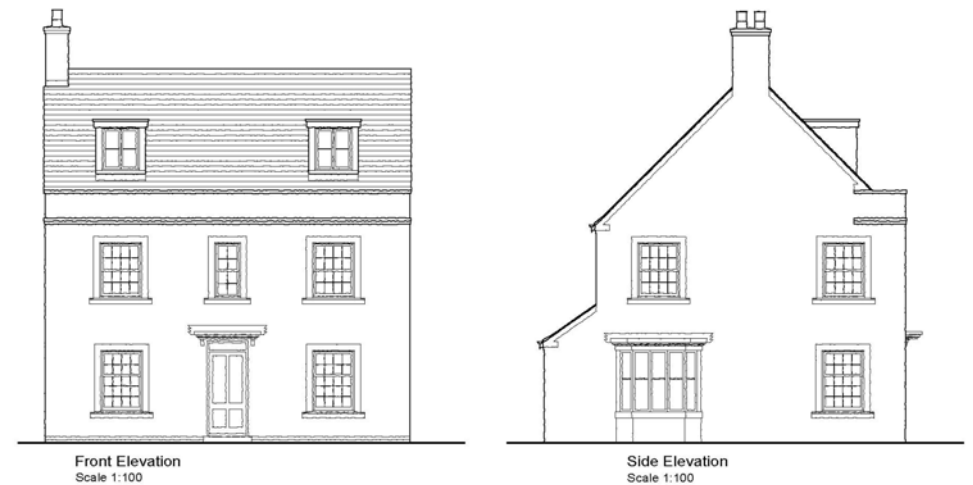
FRONT & SIDE ELEVATION OF KM3 MARKER BUILDING
